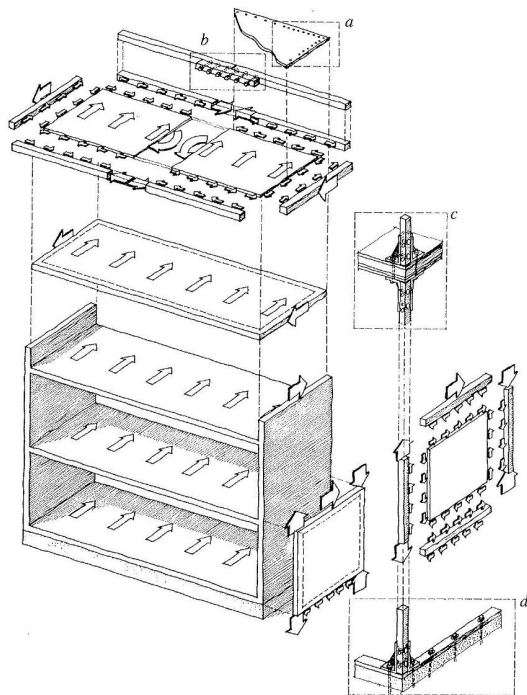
Details assuring structural continuity under horizontal actions. *a* corner reinforcement, *b* tension joint of the ring beam, *c* tension joint of vertical members, *d* prevention of sliding and uplifting from foundations. (STEP 1995 Article D10)
